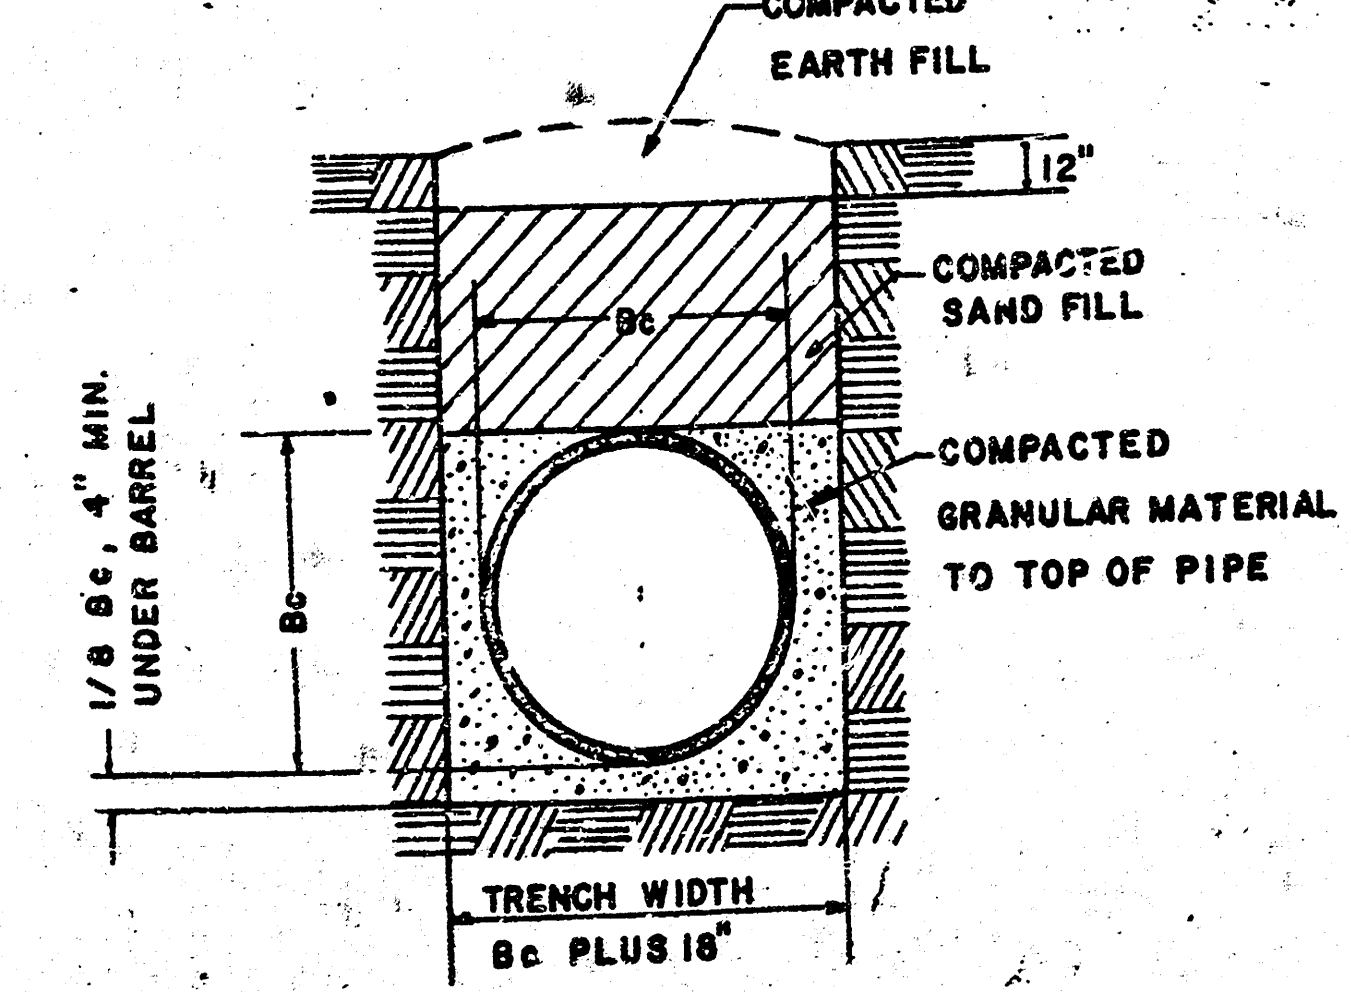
DETAIL OF IMPROVED BEDDING FOR DUCTILE IRON PIPE
